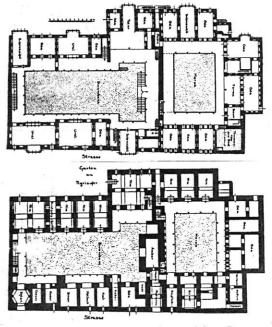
Ground floor plan and first floor of the harem and diwankhana.
